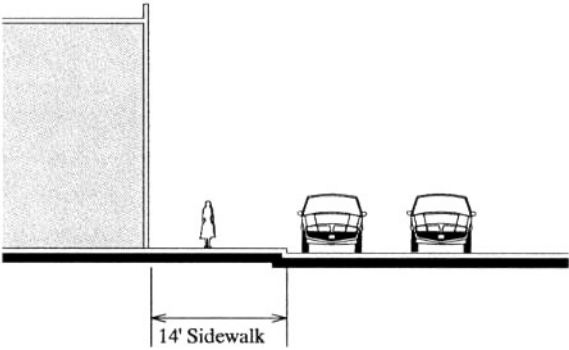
A (above): Sidewalks on Commercial Streets. A cross section and plan of a sidewalk on a commercial street. Commercial sidewalks are typically 14 feet wide to accommodate pedestrian and commercial use, such as sidewalk cafes. Typically an amenity zone filled with trees, lights, mailboxes, and other street furniture, buffers the pedestrian from the street. This same plan and section also apply to the commercial nodes of community streets.
